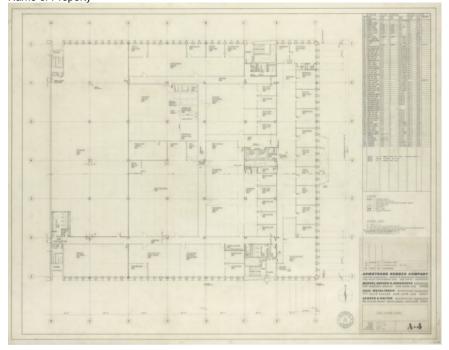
2nd Floor Plan (Source: Marcel Breuer Digital Archive, Syracuse University)
